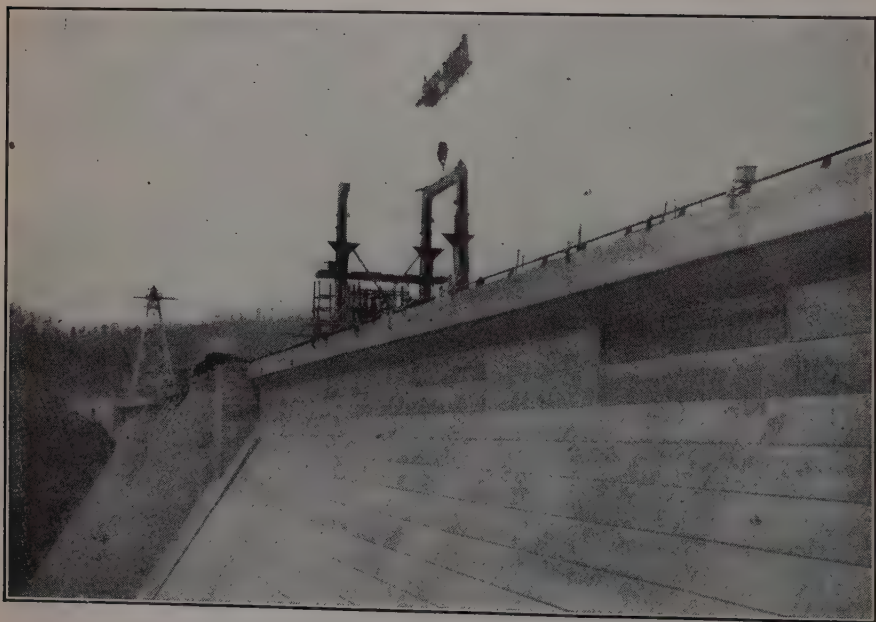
DOWNSTREAM FACE, SOUTH ABUTMENT, SHOWING HORIZONTAL CHAMFERED JOINTS, AND CRANE ASSEMBLY ON TOP
